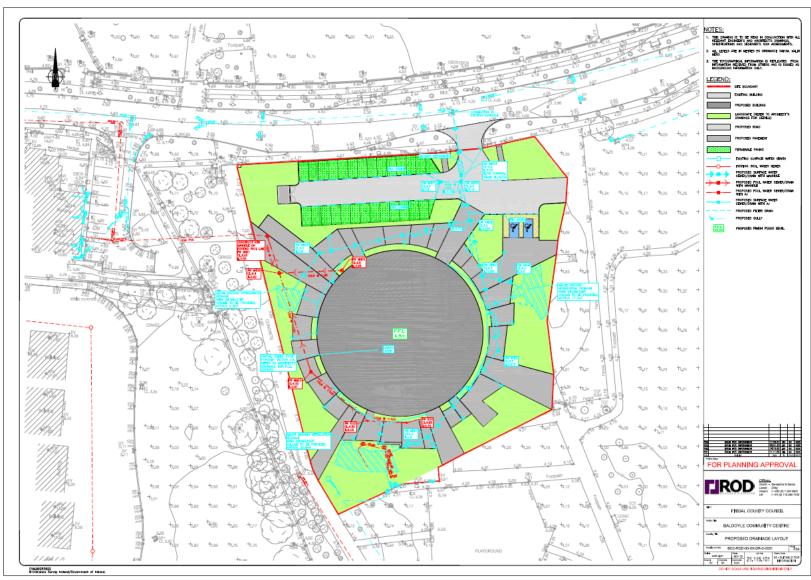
Proposed drainage layout (Source: Roughan & O'Donovan Consulting Engineers, 2023a)
